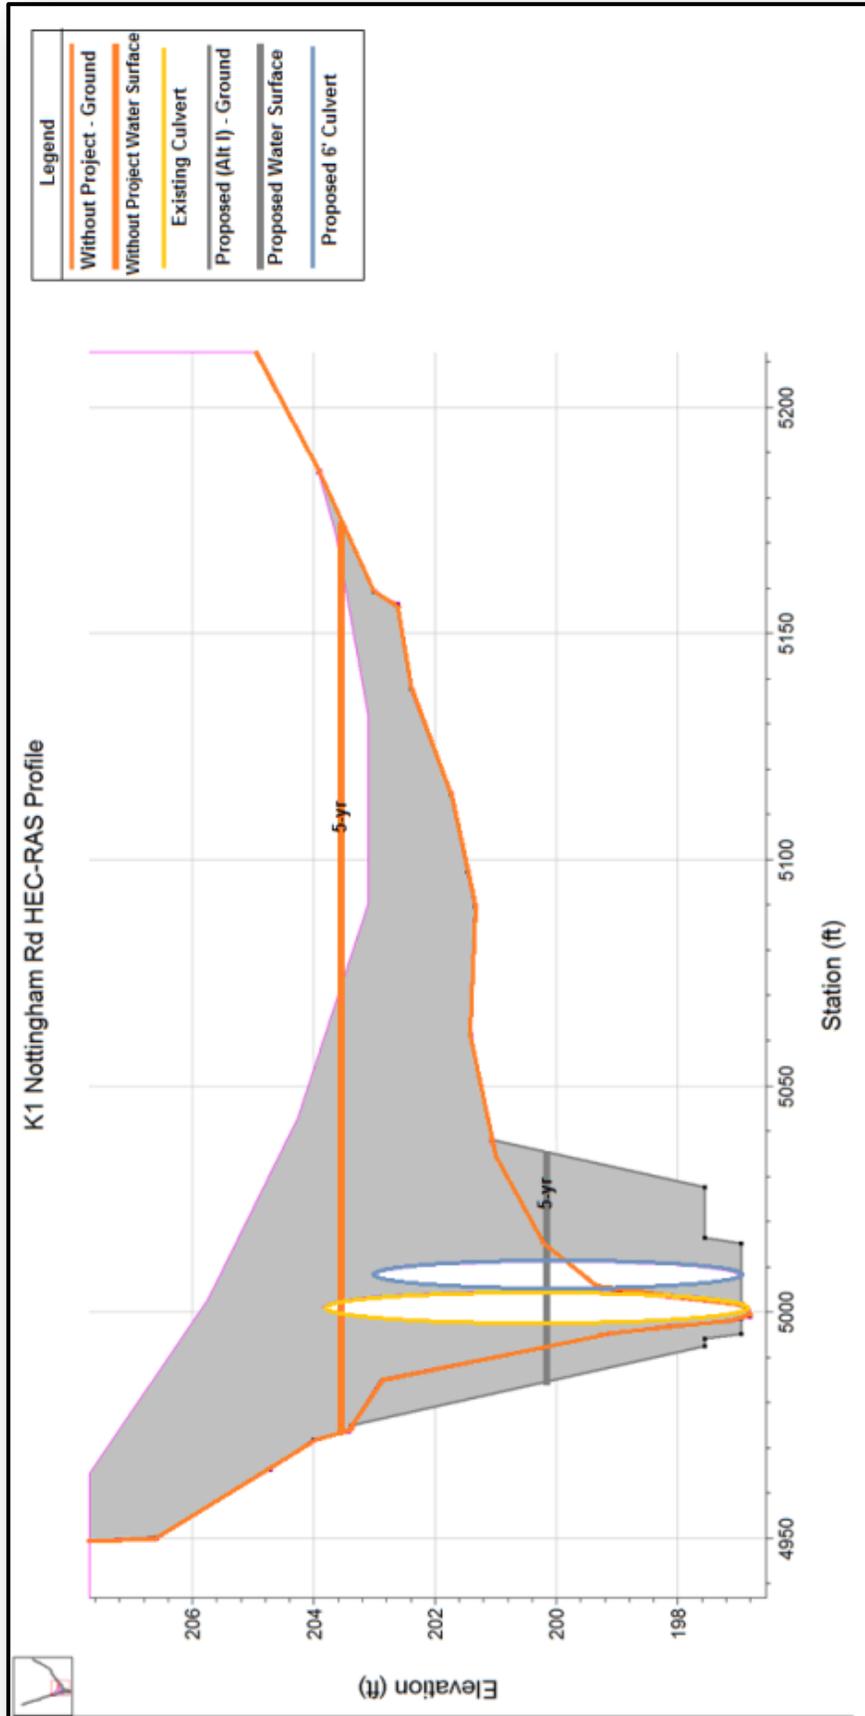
Proposed Nottingham Road Culvert Addition and Associated Reduction in Water Surface Elevation
